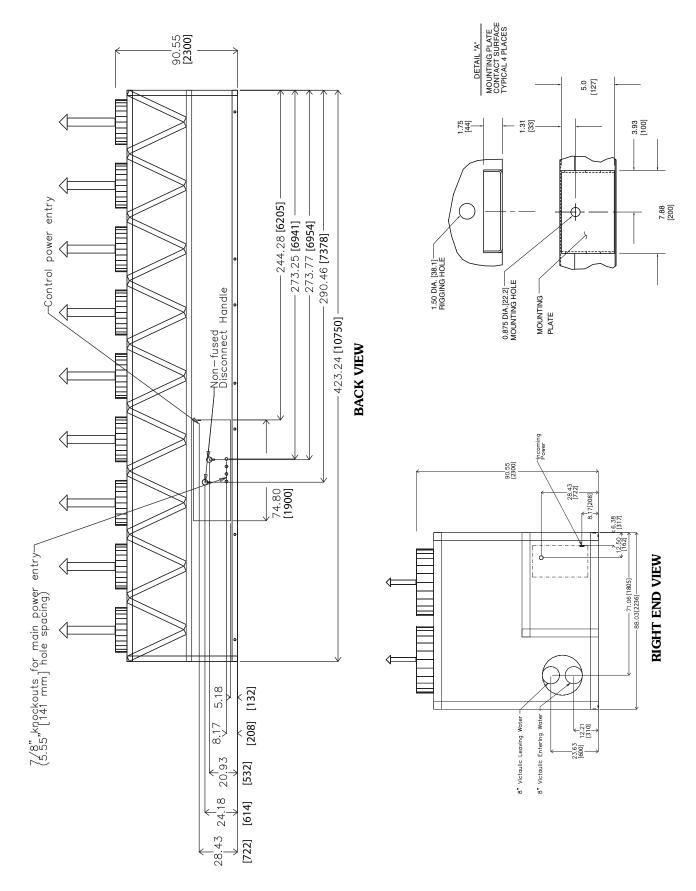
30XA325,350 Air-Cooled Liquid Chiller Dimensions (cont)
